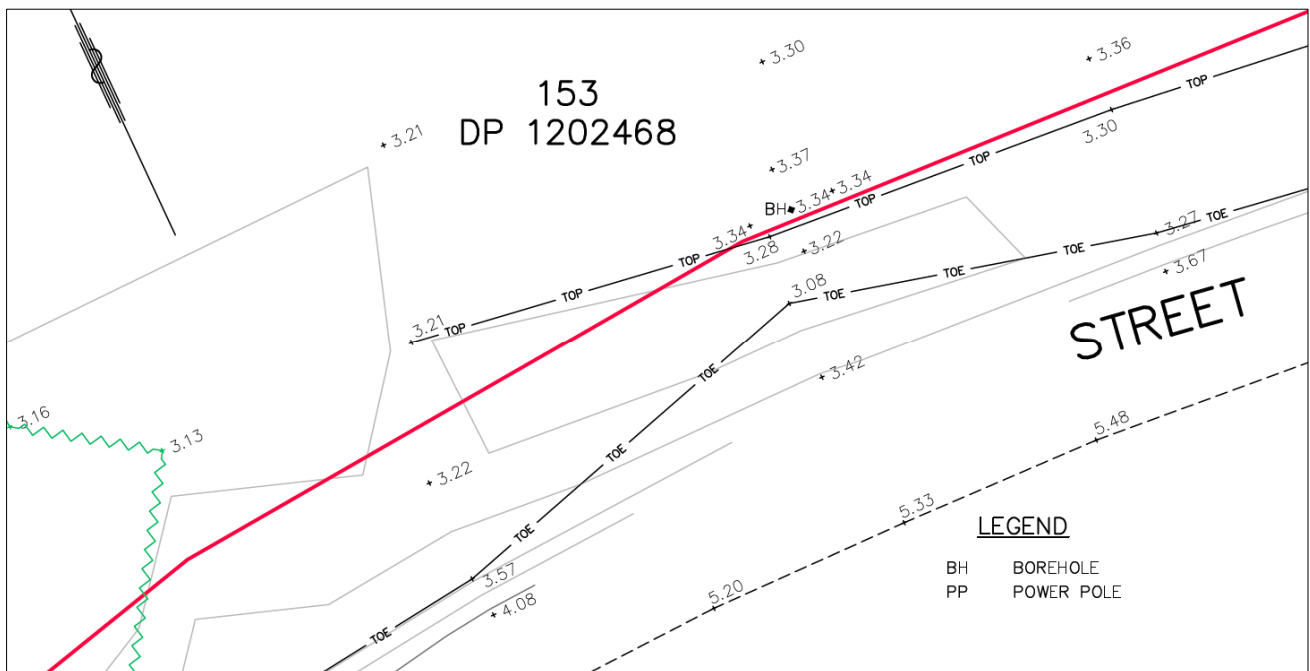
Excerpt of Survey Plan. Source: Monteath & Powys dated 20/12/2021
